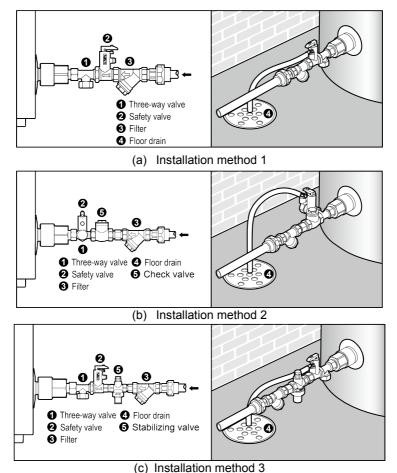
Safety valve installation diagram of cold water inlet pipe
